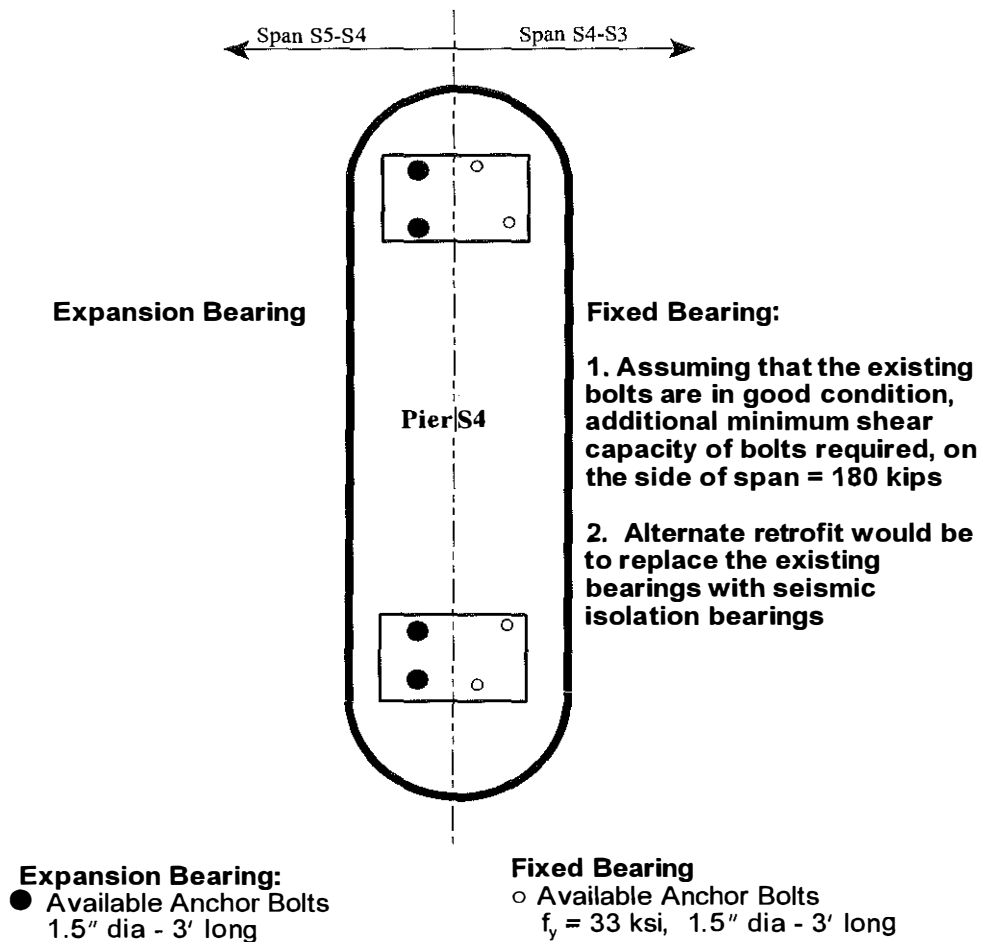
Minimum Required Shear Capacity ( $V_{req}$ ) to be Provided by Additional Anchor Bolts at Bearings of Pier S4 on the Henderson, KY Approach of the US41 Northbound Bridge
